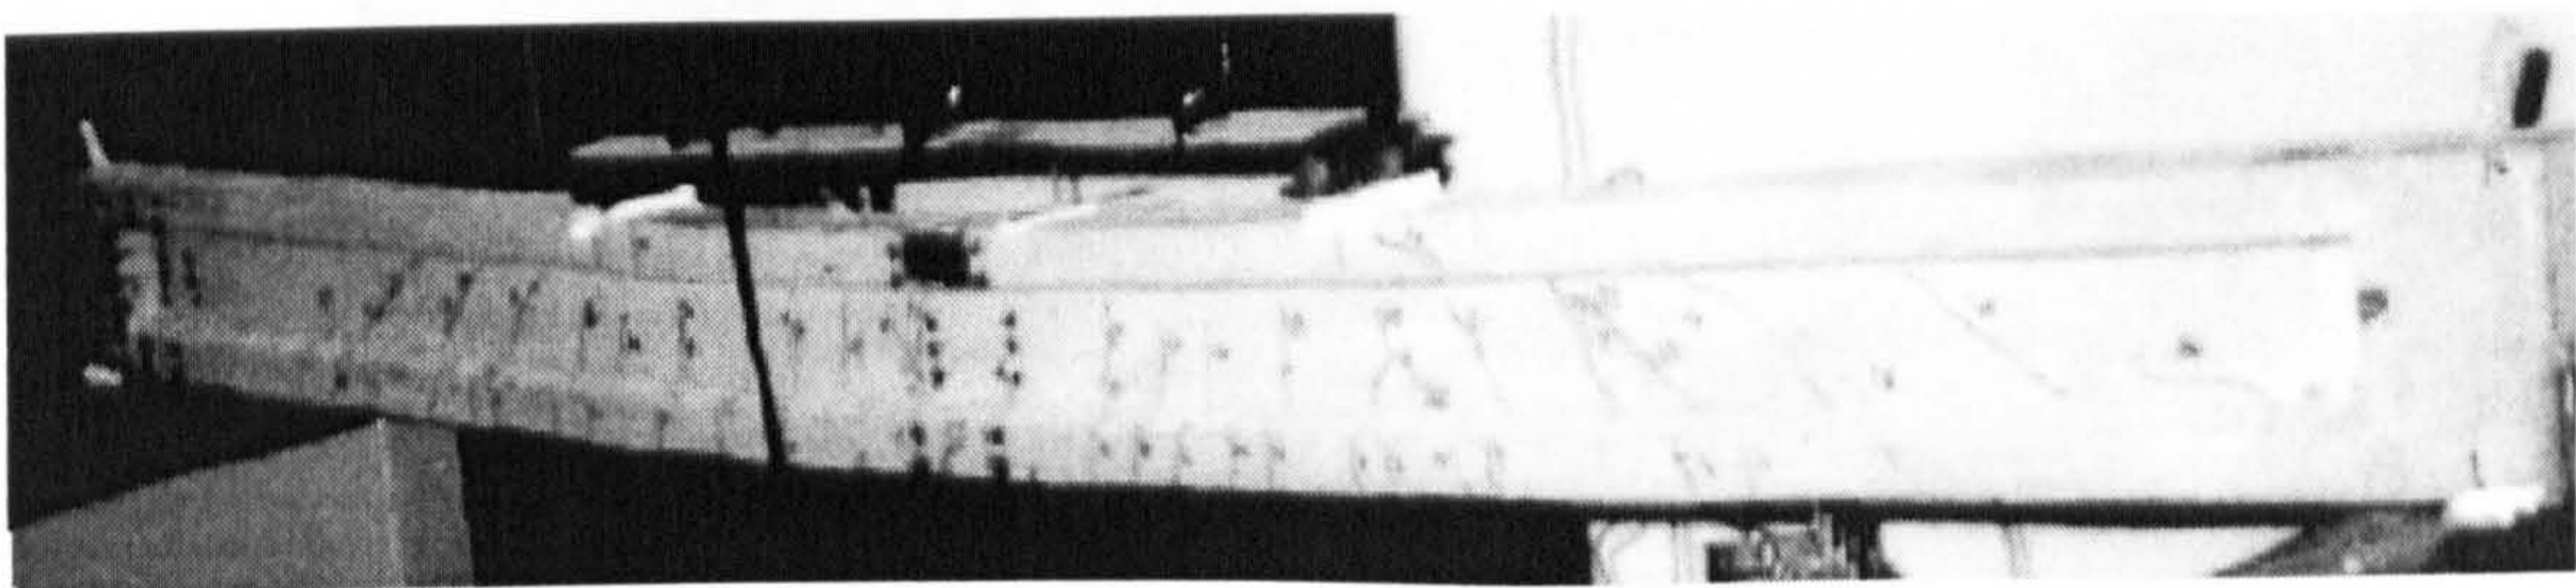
Cracks pattern of internal prestressing beam
